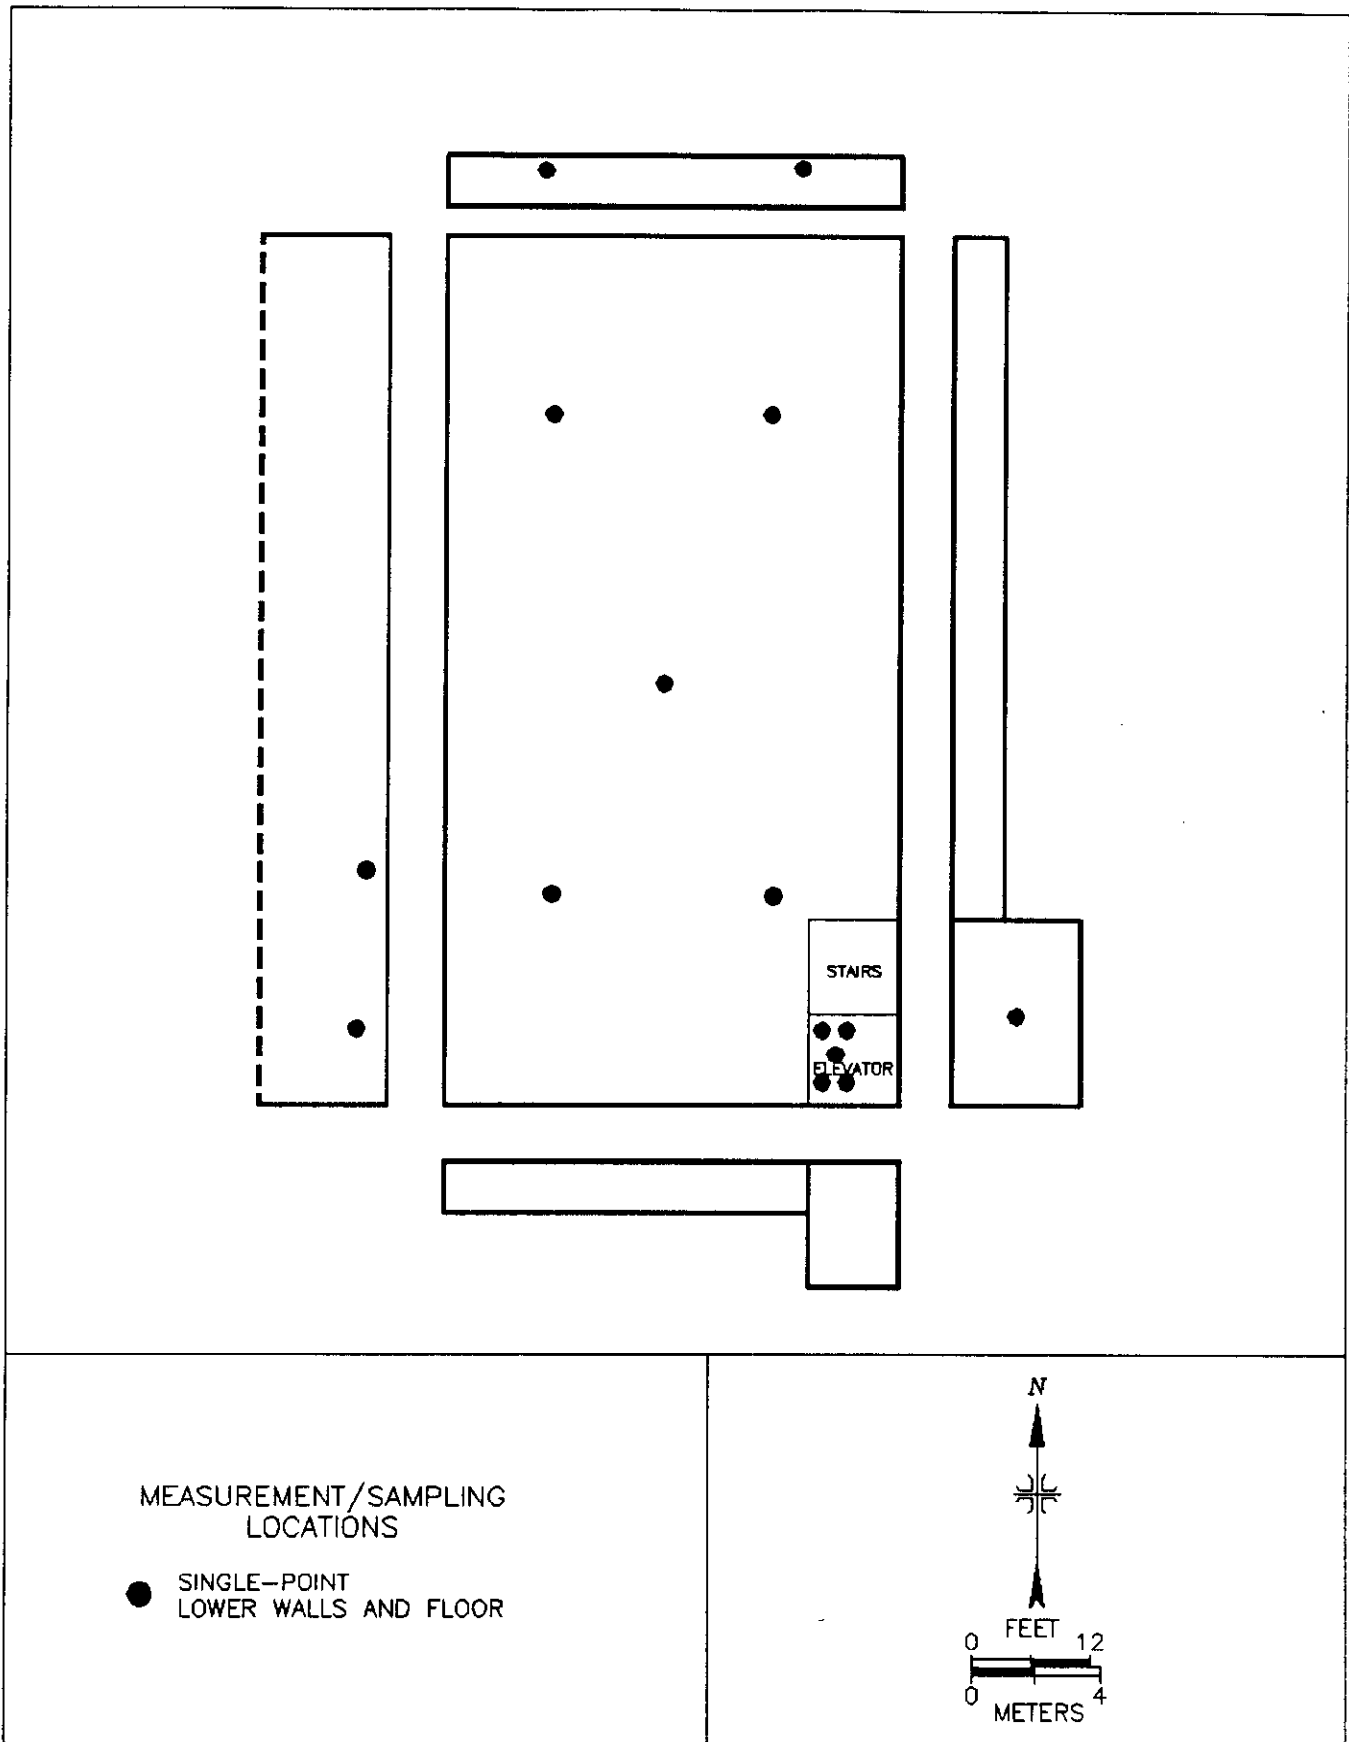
Roof, West Bay – Measurement and Sampling Locations
